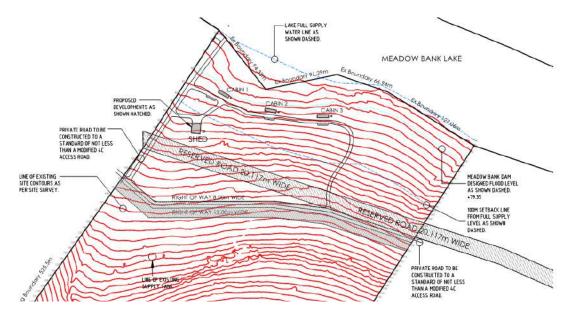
Plan of proposed development (Source: DA2022/05 StudioKo architecture design & drafting)
